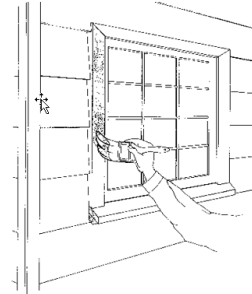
PAINT OR PRIME ALL BARE WOOD ON EXTERIOR FRAME
